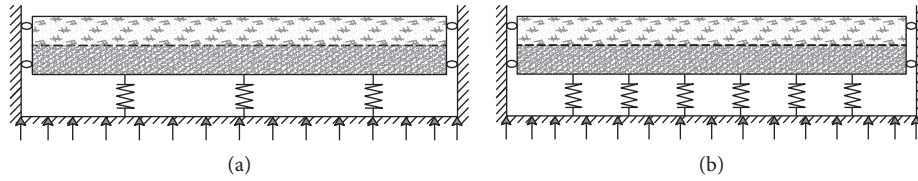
Simplified calculation of the vibration isolation slab. (a) A-A cross section. (b) B-B cross section.
